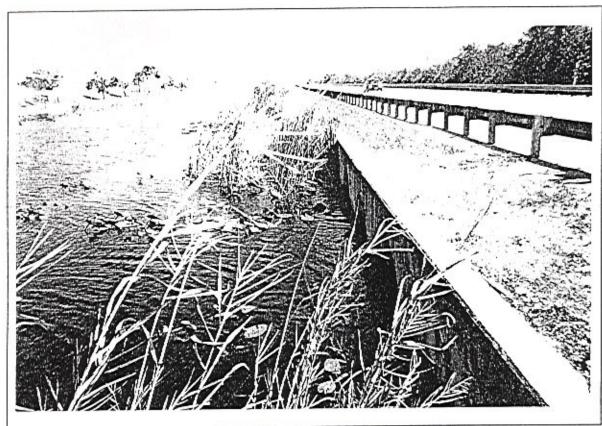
Example of northern culvert openings 1/2 full of water, with moderate to rapid flow, and sparse vegetation.
